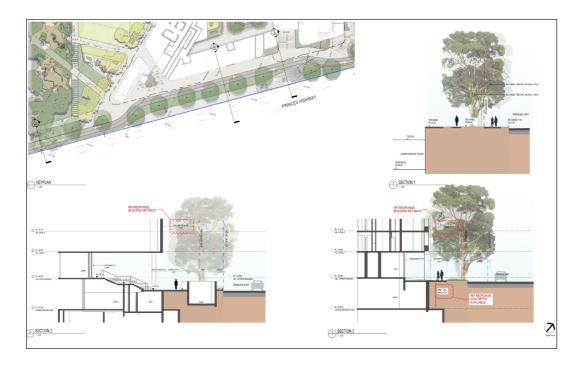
| Amended Princess Highway Landscape Sections (Source: RFI)
